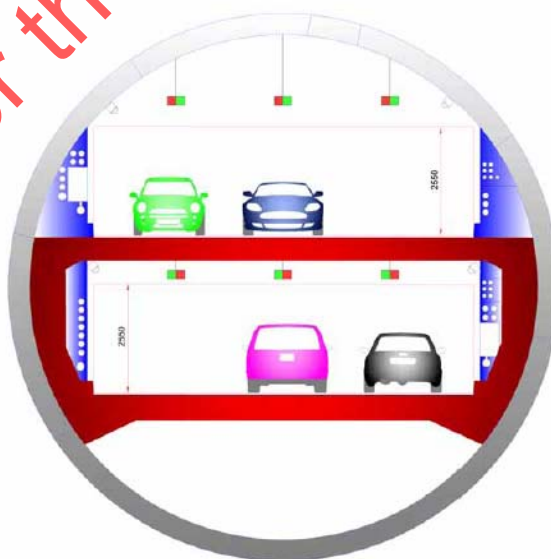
SMART - Typical cross section. Road decks designed to resist water pressures
